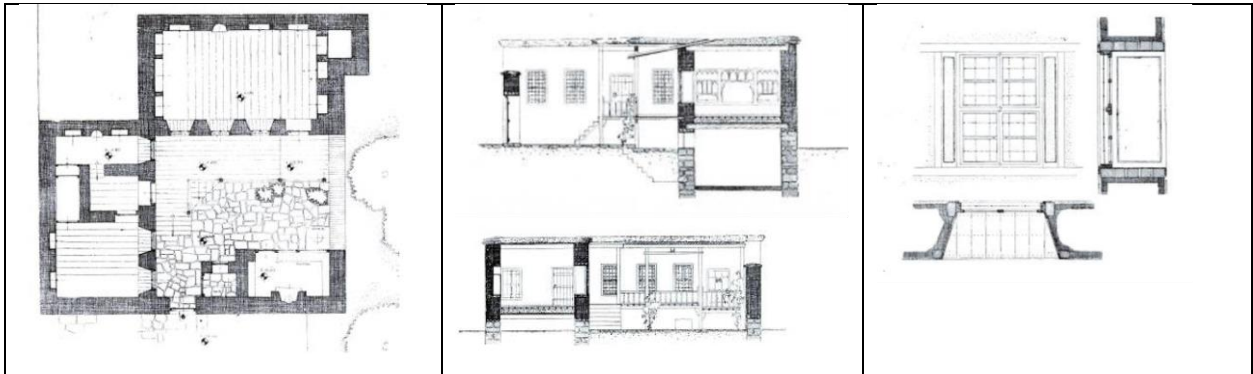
A house in Konya Esenlu neighborhood with hayat (garden) and two room. (Berk, 1951) From left to right figure first (a) house plan (garden)+room(s)+without sofa (hall), second (b) two section , third (c) figure systemic detail plan of a window of house (Berk,1951)
